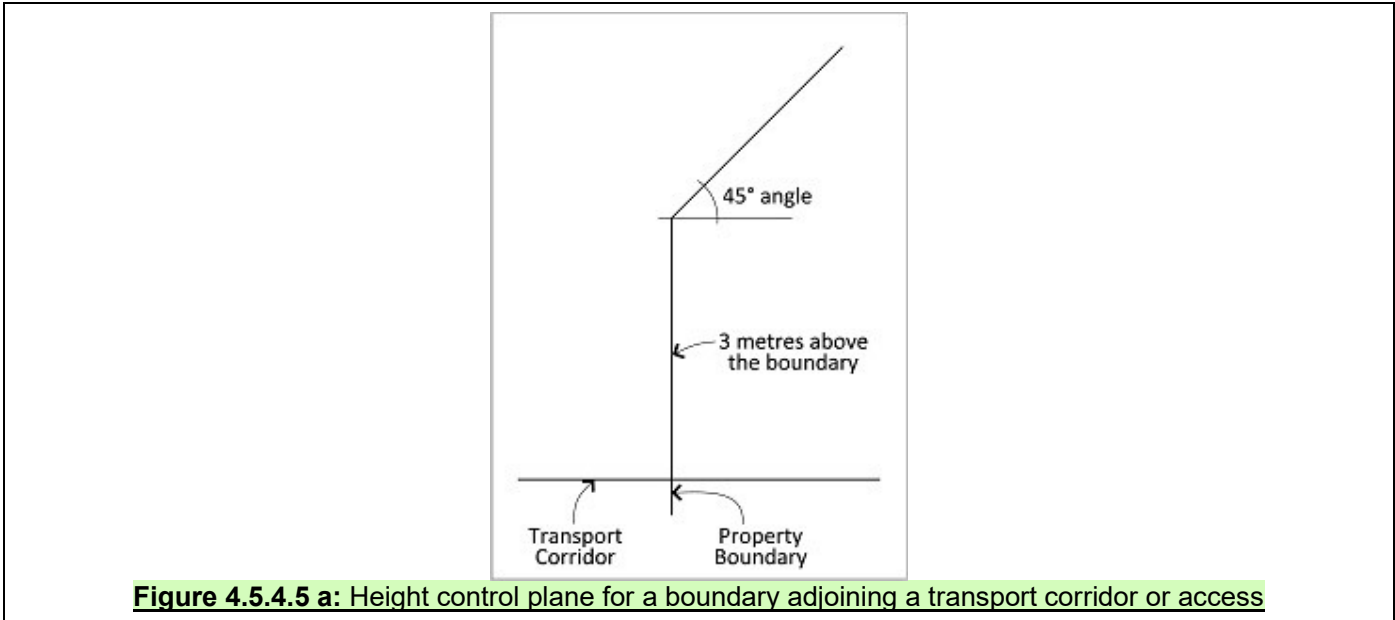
a: Height control plane for a boundary adjoining a transport corridor or access
